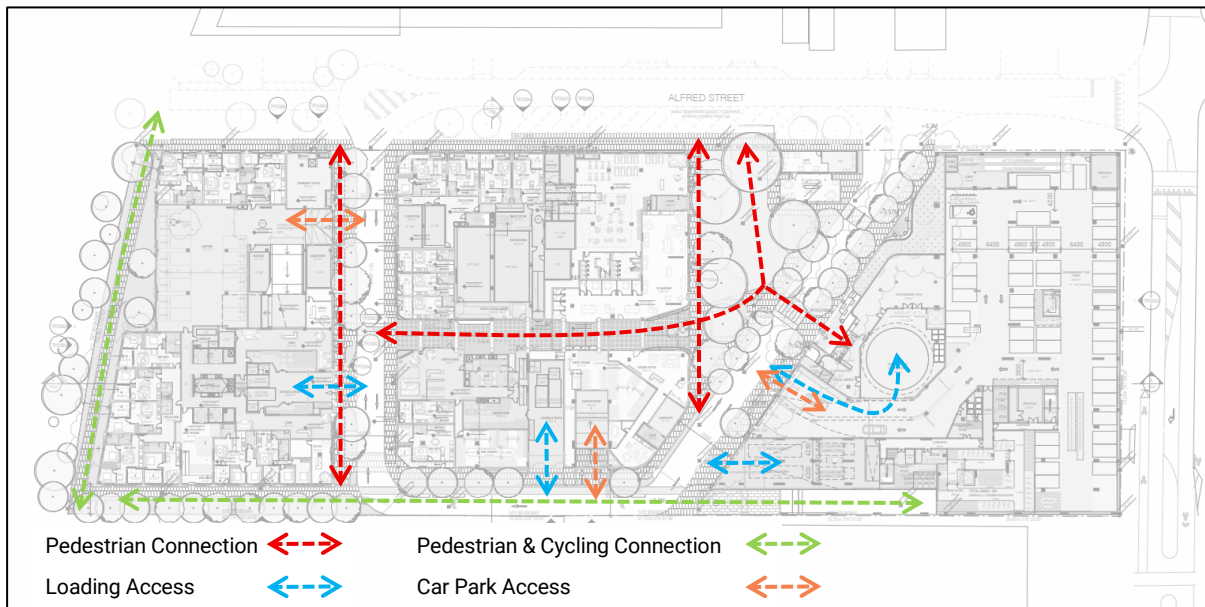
Proposed Site-Specific Vehicular Access Arrangements – Lower Ground
